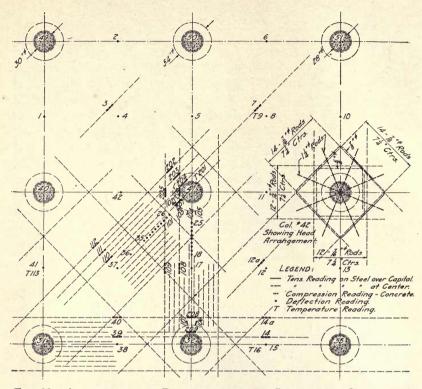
ARRANGEMENT OF REINFORCEMENT AND LOCATION OF OBSERVATION POINTS.
